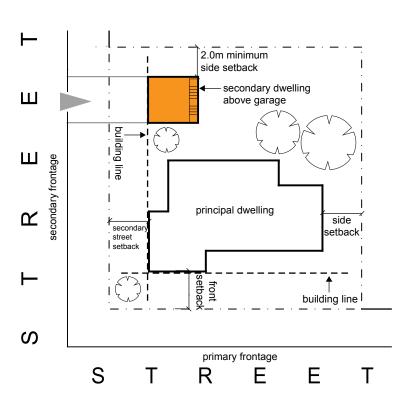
A.3-4: Setback controls for secondary dwellings above a detached garage accessible from a secondary street.
